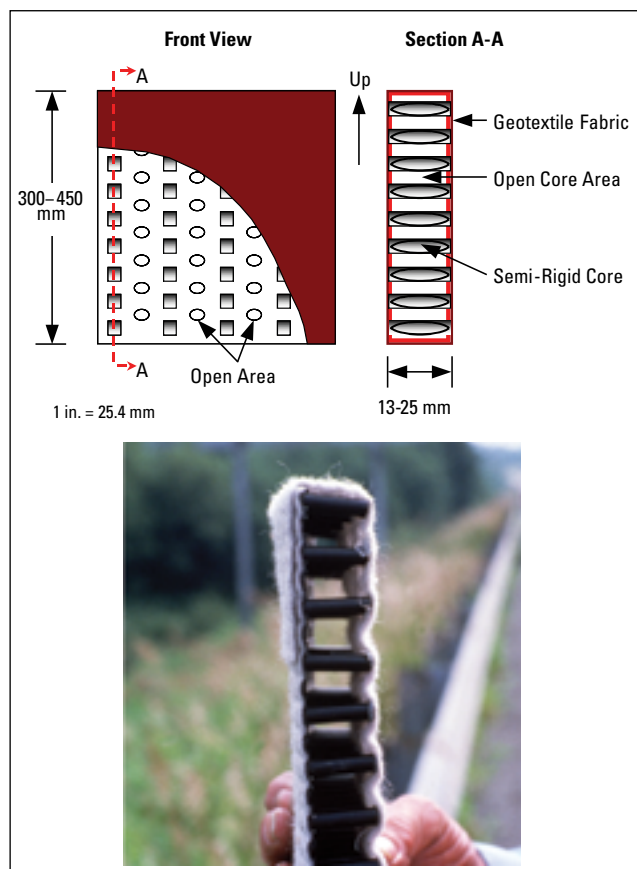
Typical prefabricated geotextile edgedrain configuration (Fleckenstein, Allen, and Harison 1994; NHI 1999)
